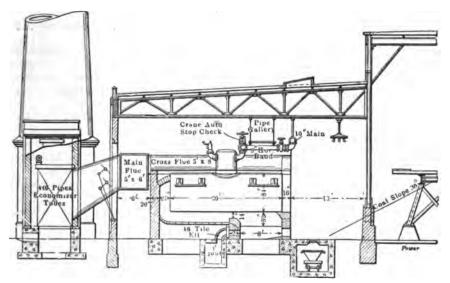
a. TYPICAL SECTION OF BOILER ROOM FOR SMALL MANUFACTURING PLANT.
